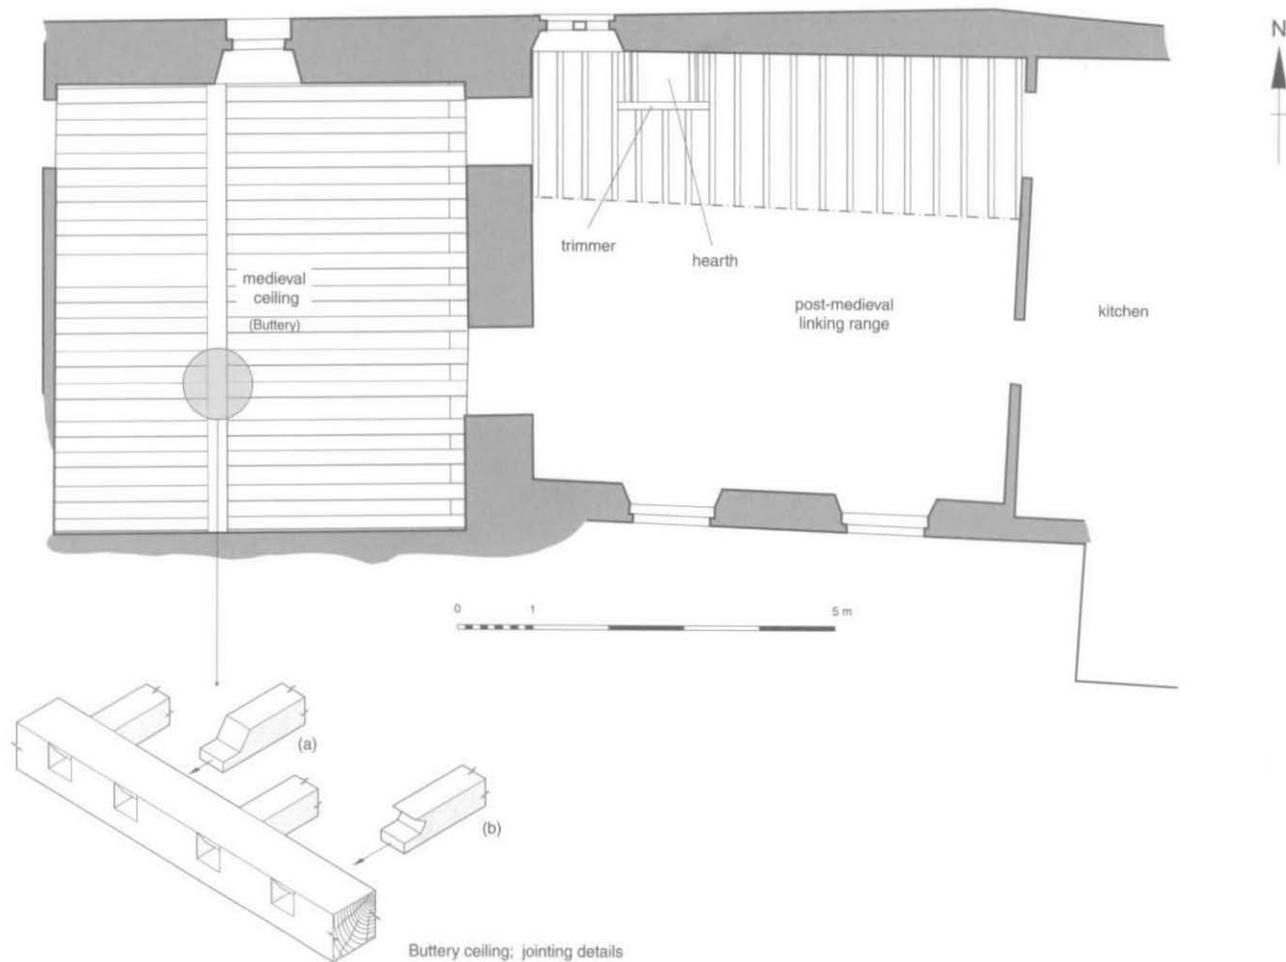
Plan of link passage and Buttery ceiling including jointing details.
